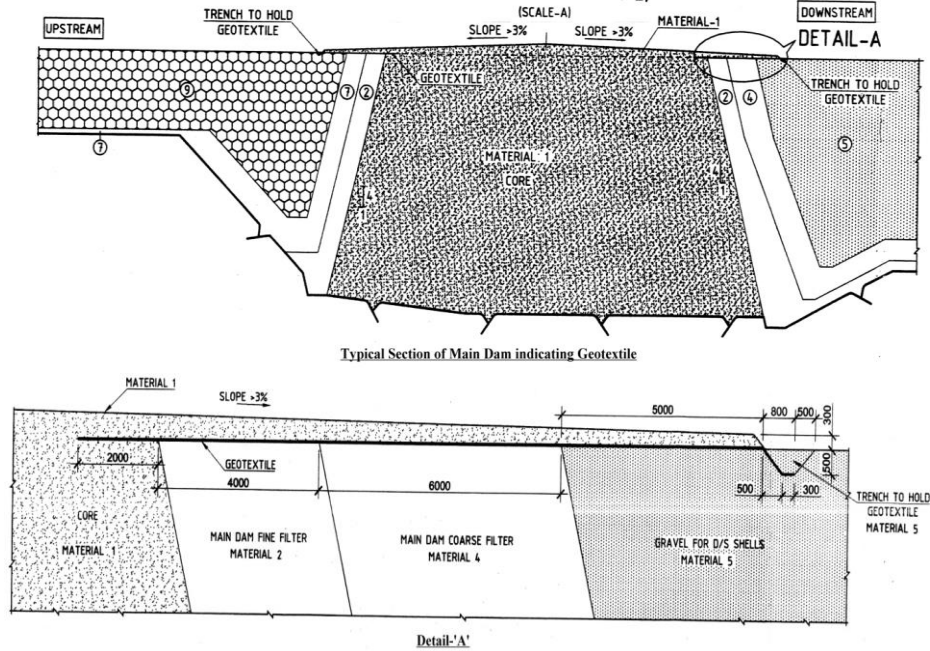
and Fig. 5. Typical arrangement of protection of filter layers using Geotextile
